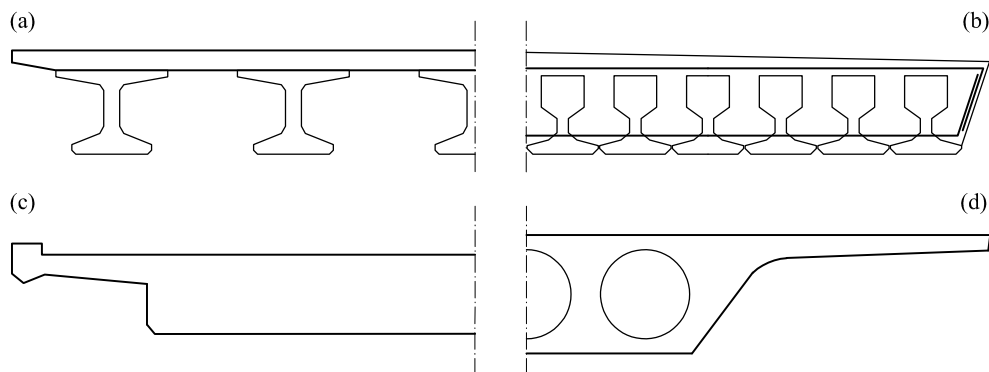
Common railway bridge decks for short-to-medium lengths: (a) pre-cast double-T girder deck; (b) concrete filler beam deck; (c) solid concrete slab; (d) voided concrete slab.
